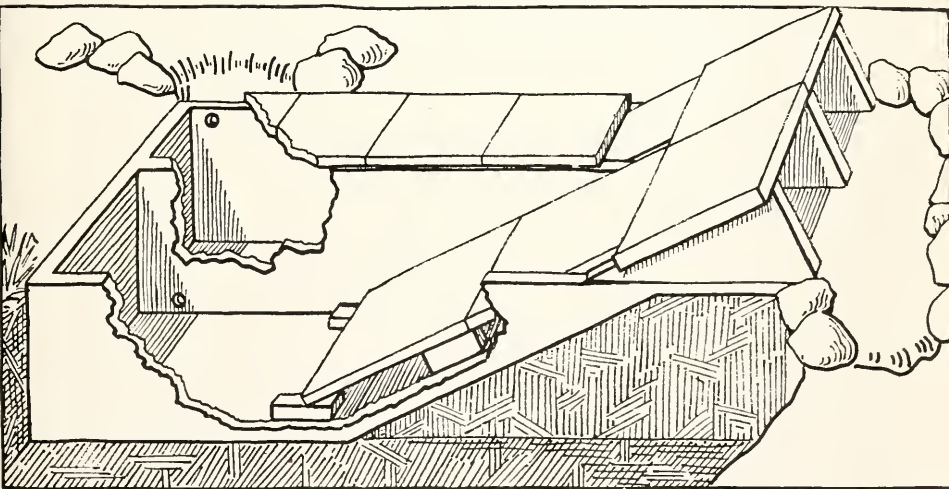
Cutaway of "Gallinaceous Guzzler." This shows the details of construction of the "Gallinaceous Guzzler." All construction is of concrete. The underground tank holds about 750 gallons of water. Concrete roof and baffle slabs retard summer evaporation. The rain collecting apron is made of concrete covered with asphalt emulsion; the size of the apron is calculated on the basis of the minimum recorded rainfall for the area in which the "Guzzler" is installed.
